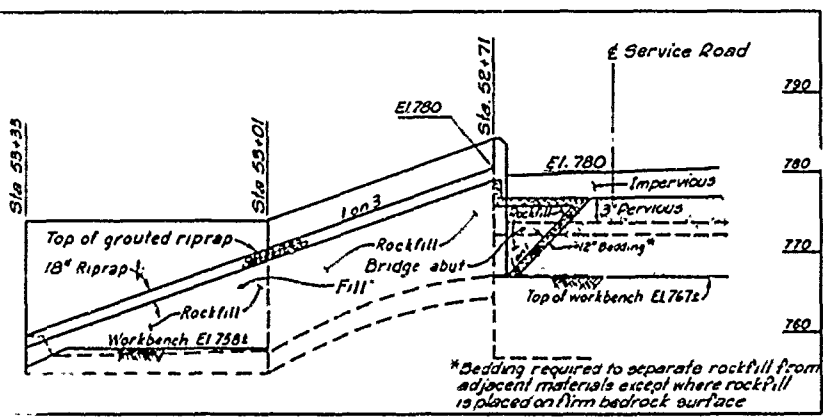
DETAIL OF SIDE-HILL DRAINAGE CHANNEL
